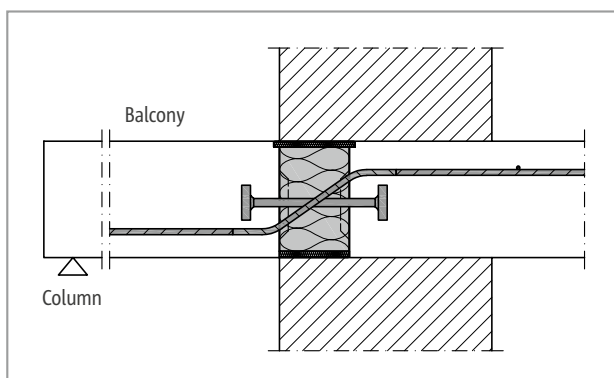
Schöck Isokorb® XT type Q-P: Connection of supported balcony with thermal insulating cavity wall
